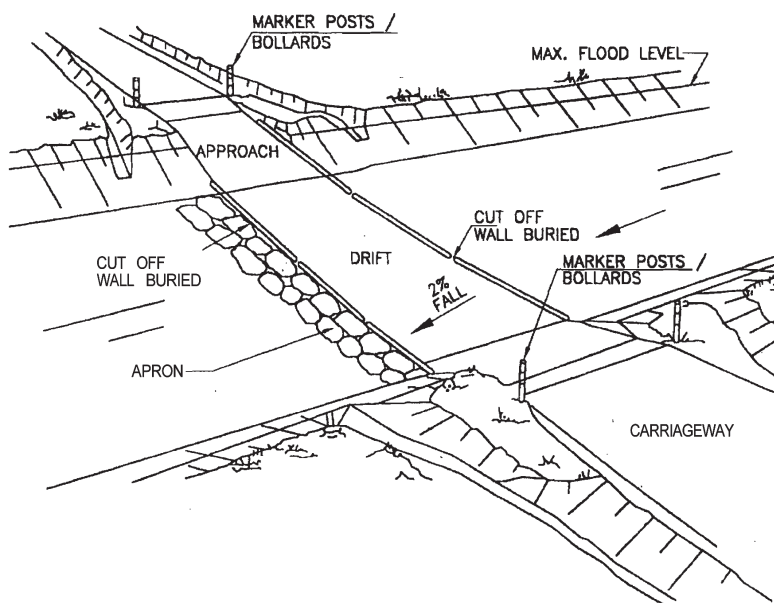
Typical Features of Paved dip/Flush Causeway
